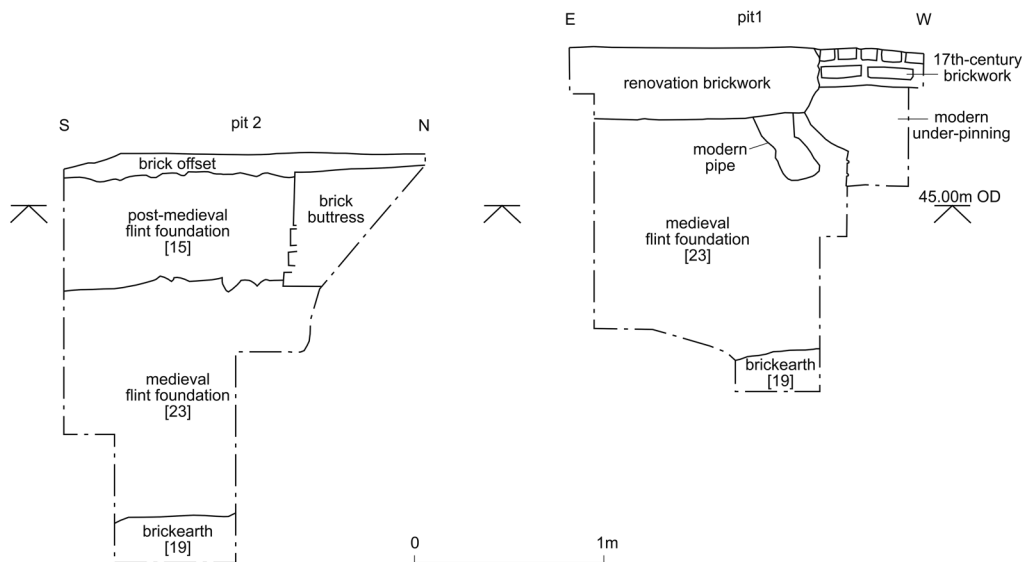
The north-facing section of test pit 1 (right) and the east-facing section of test pit 2 (left), showing the medieval flint foundation, [23], below later rebuilds. The location of these two sections is shown on Fig 7 (scale 1:40)
